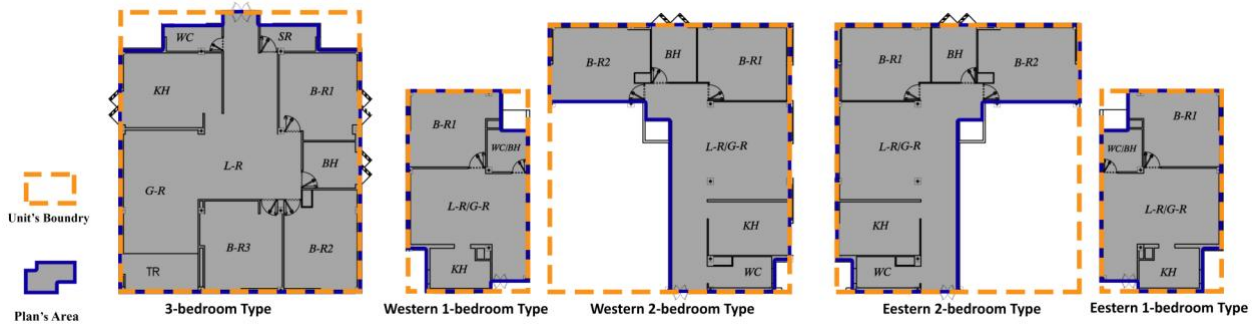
Determination of building unit's boundary in the 5 plan types.
